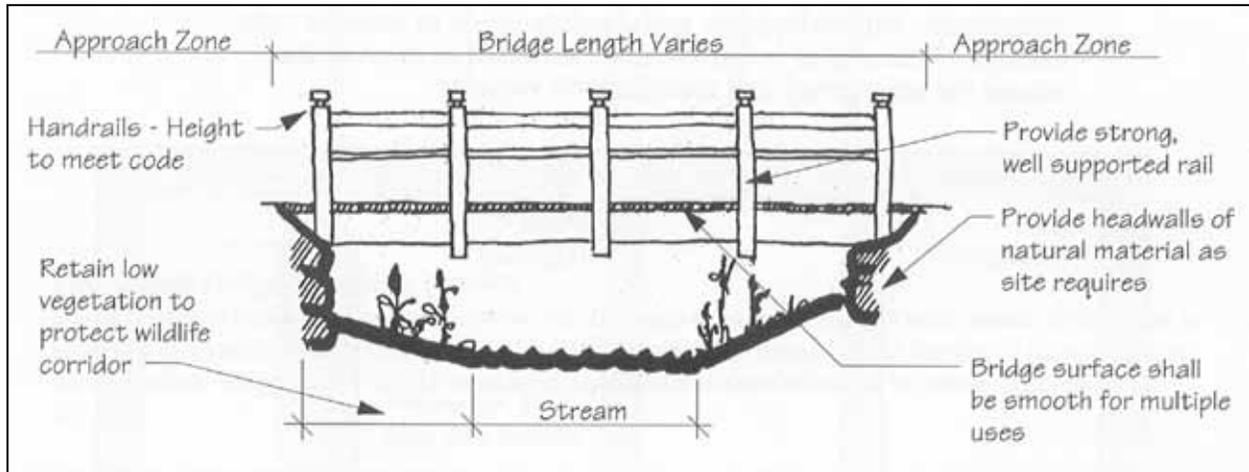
Typical Timber Bridge Construction Guidelines
